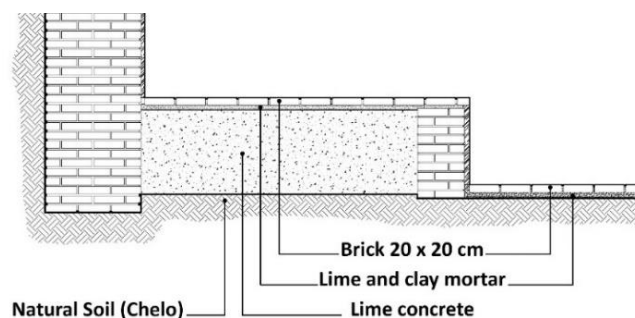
, Aghaei house in Yazd, foundation detail, Source: Shamsheh consulting engineers, (YCHHTO 2013)
